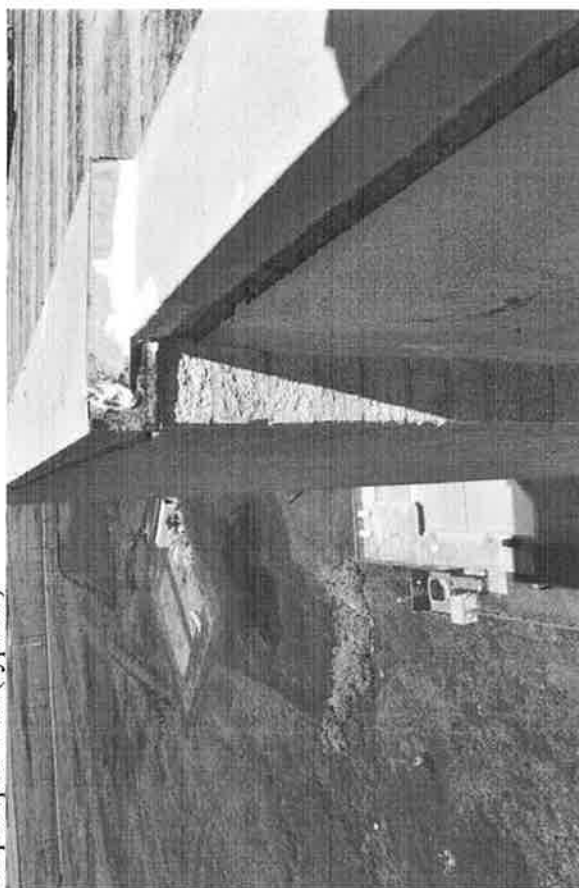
Repairs to mod-bit cap sheet around plumbing vent (typical)
